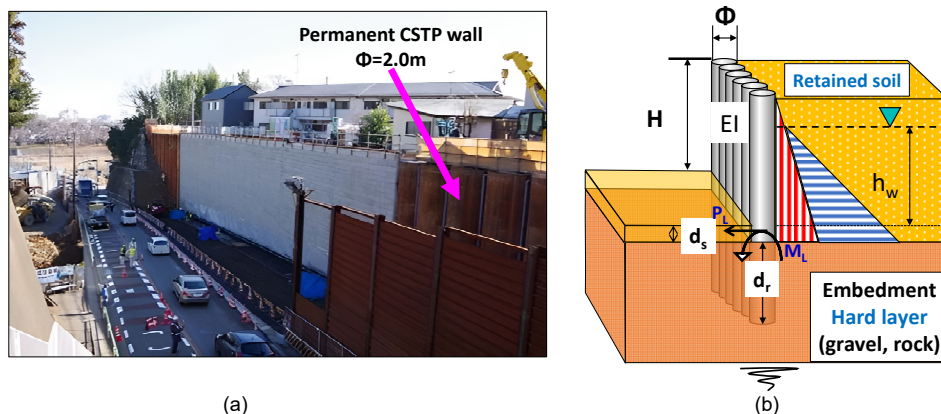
Cantilever steel tubular pile (CSTP) wall embedded in hard layer: (a) Application of CSTP wall (Kitamura and Kamimura, 2018); (b) loads expected on CSTP wall during design period
